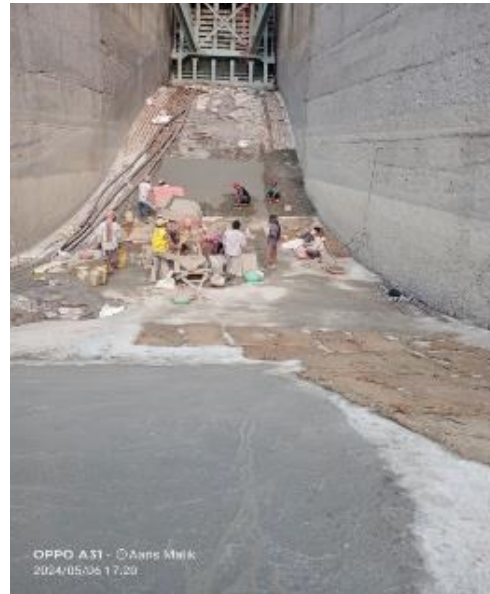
Surface preparation and laying of reinforcement of sluice spillway at Radial Gate No. 4.
